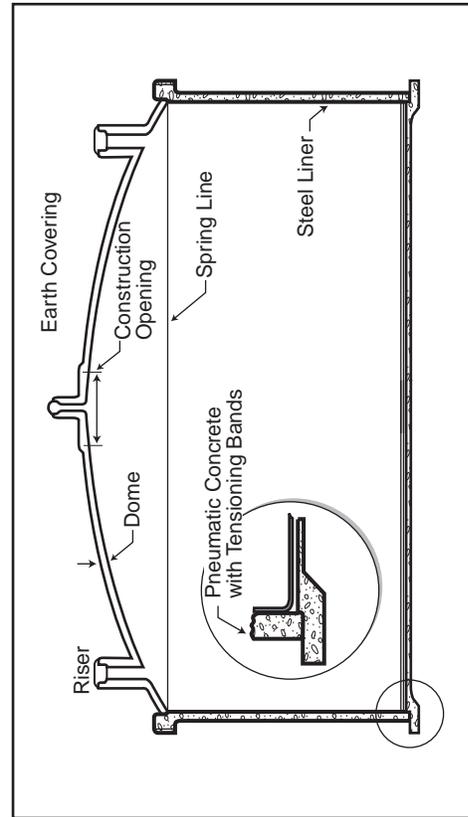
C. Uncooled Waste Storage Tank, Type IV (Prestressed concrete walls)
